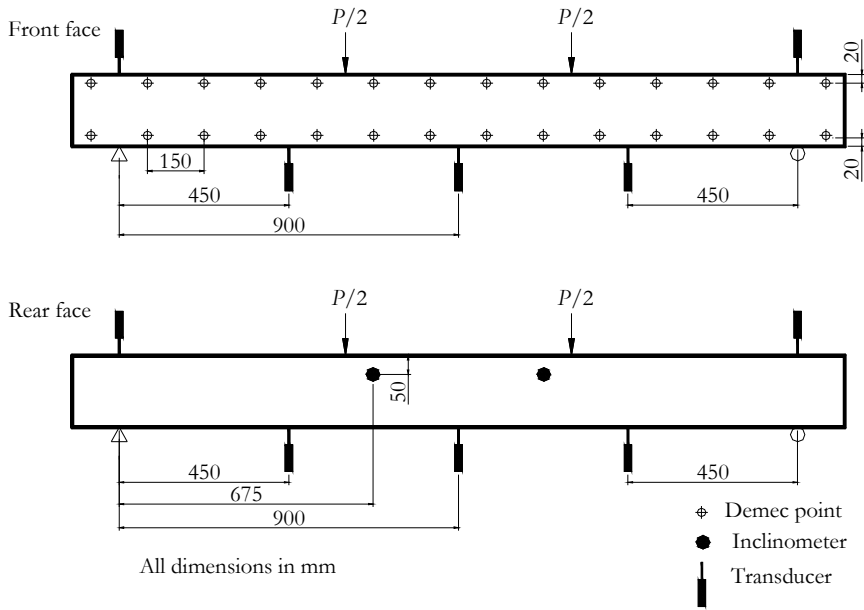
Instrumentation details for beam C1-212-D2-A.
